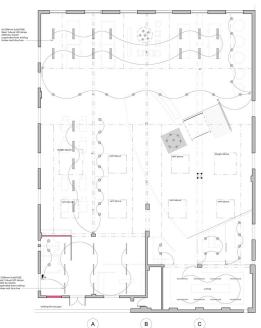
First floor lighting & ceiling plan-not to scale (Author 2013)
